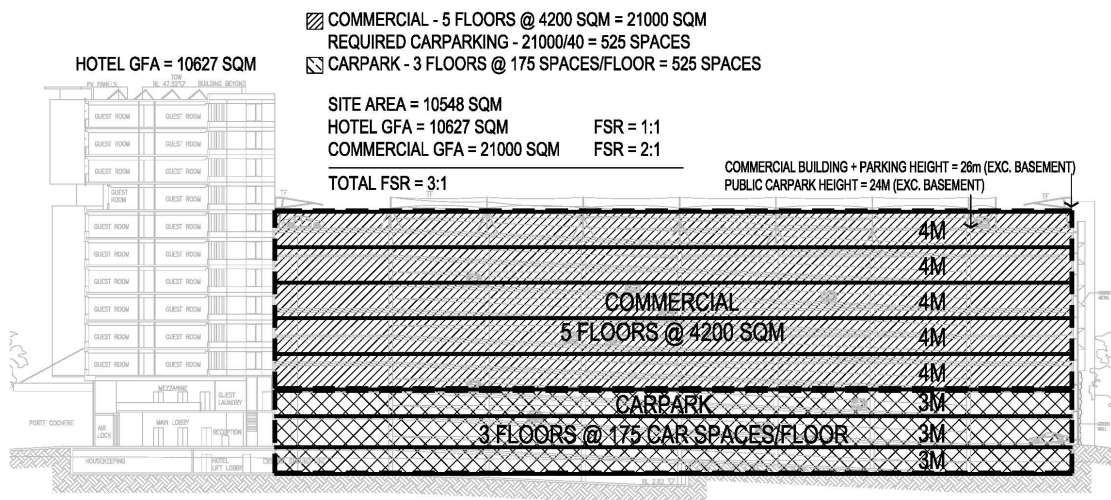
Proposed cross section showing possible hotel and commercial development with an FSR of 3.0:1 at an equivalent height as the proposed carpark.
